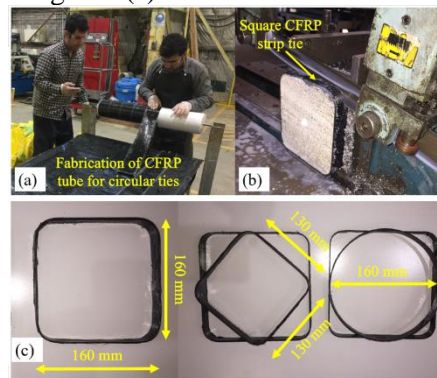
Fabrication and cutting process of CFRP tubes for CST: (a) CFRP tube formation; (b) cutting of CFRP tubes; and (c) S, SS, and SC configurations of CST.
